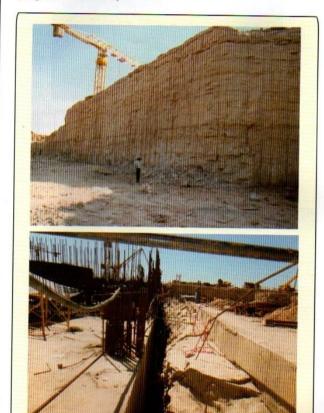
Pre-split Blast Wall and the Subsequent Civil Constructions of the Nuclear Plant
